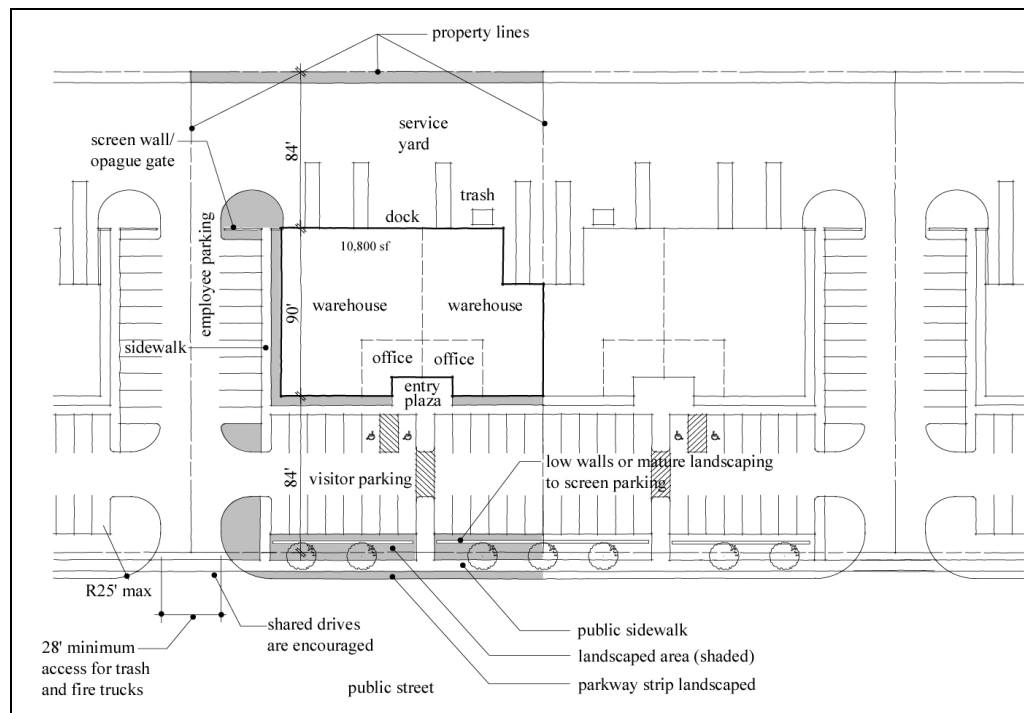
Zero Lot Line Layout Traffic circulation and Parking with Setbacks
